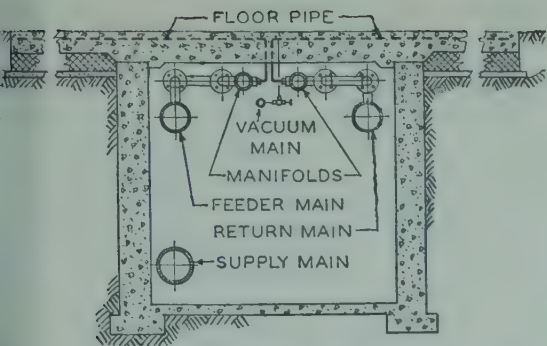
Carpenter Monolithic Floor and Piping System. Center Trench System.
